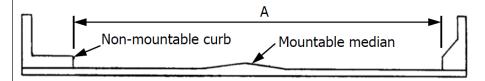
Cross-section view of a highway feature carried on the bridge with a mountable median.
